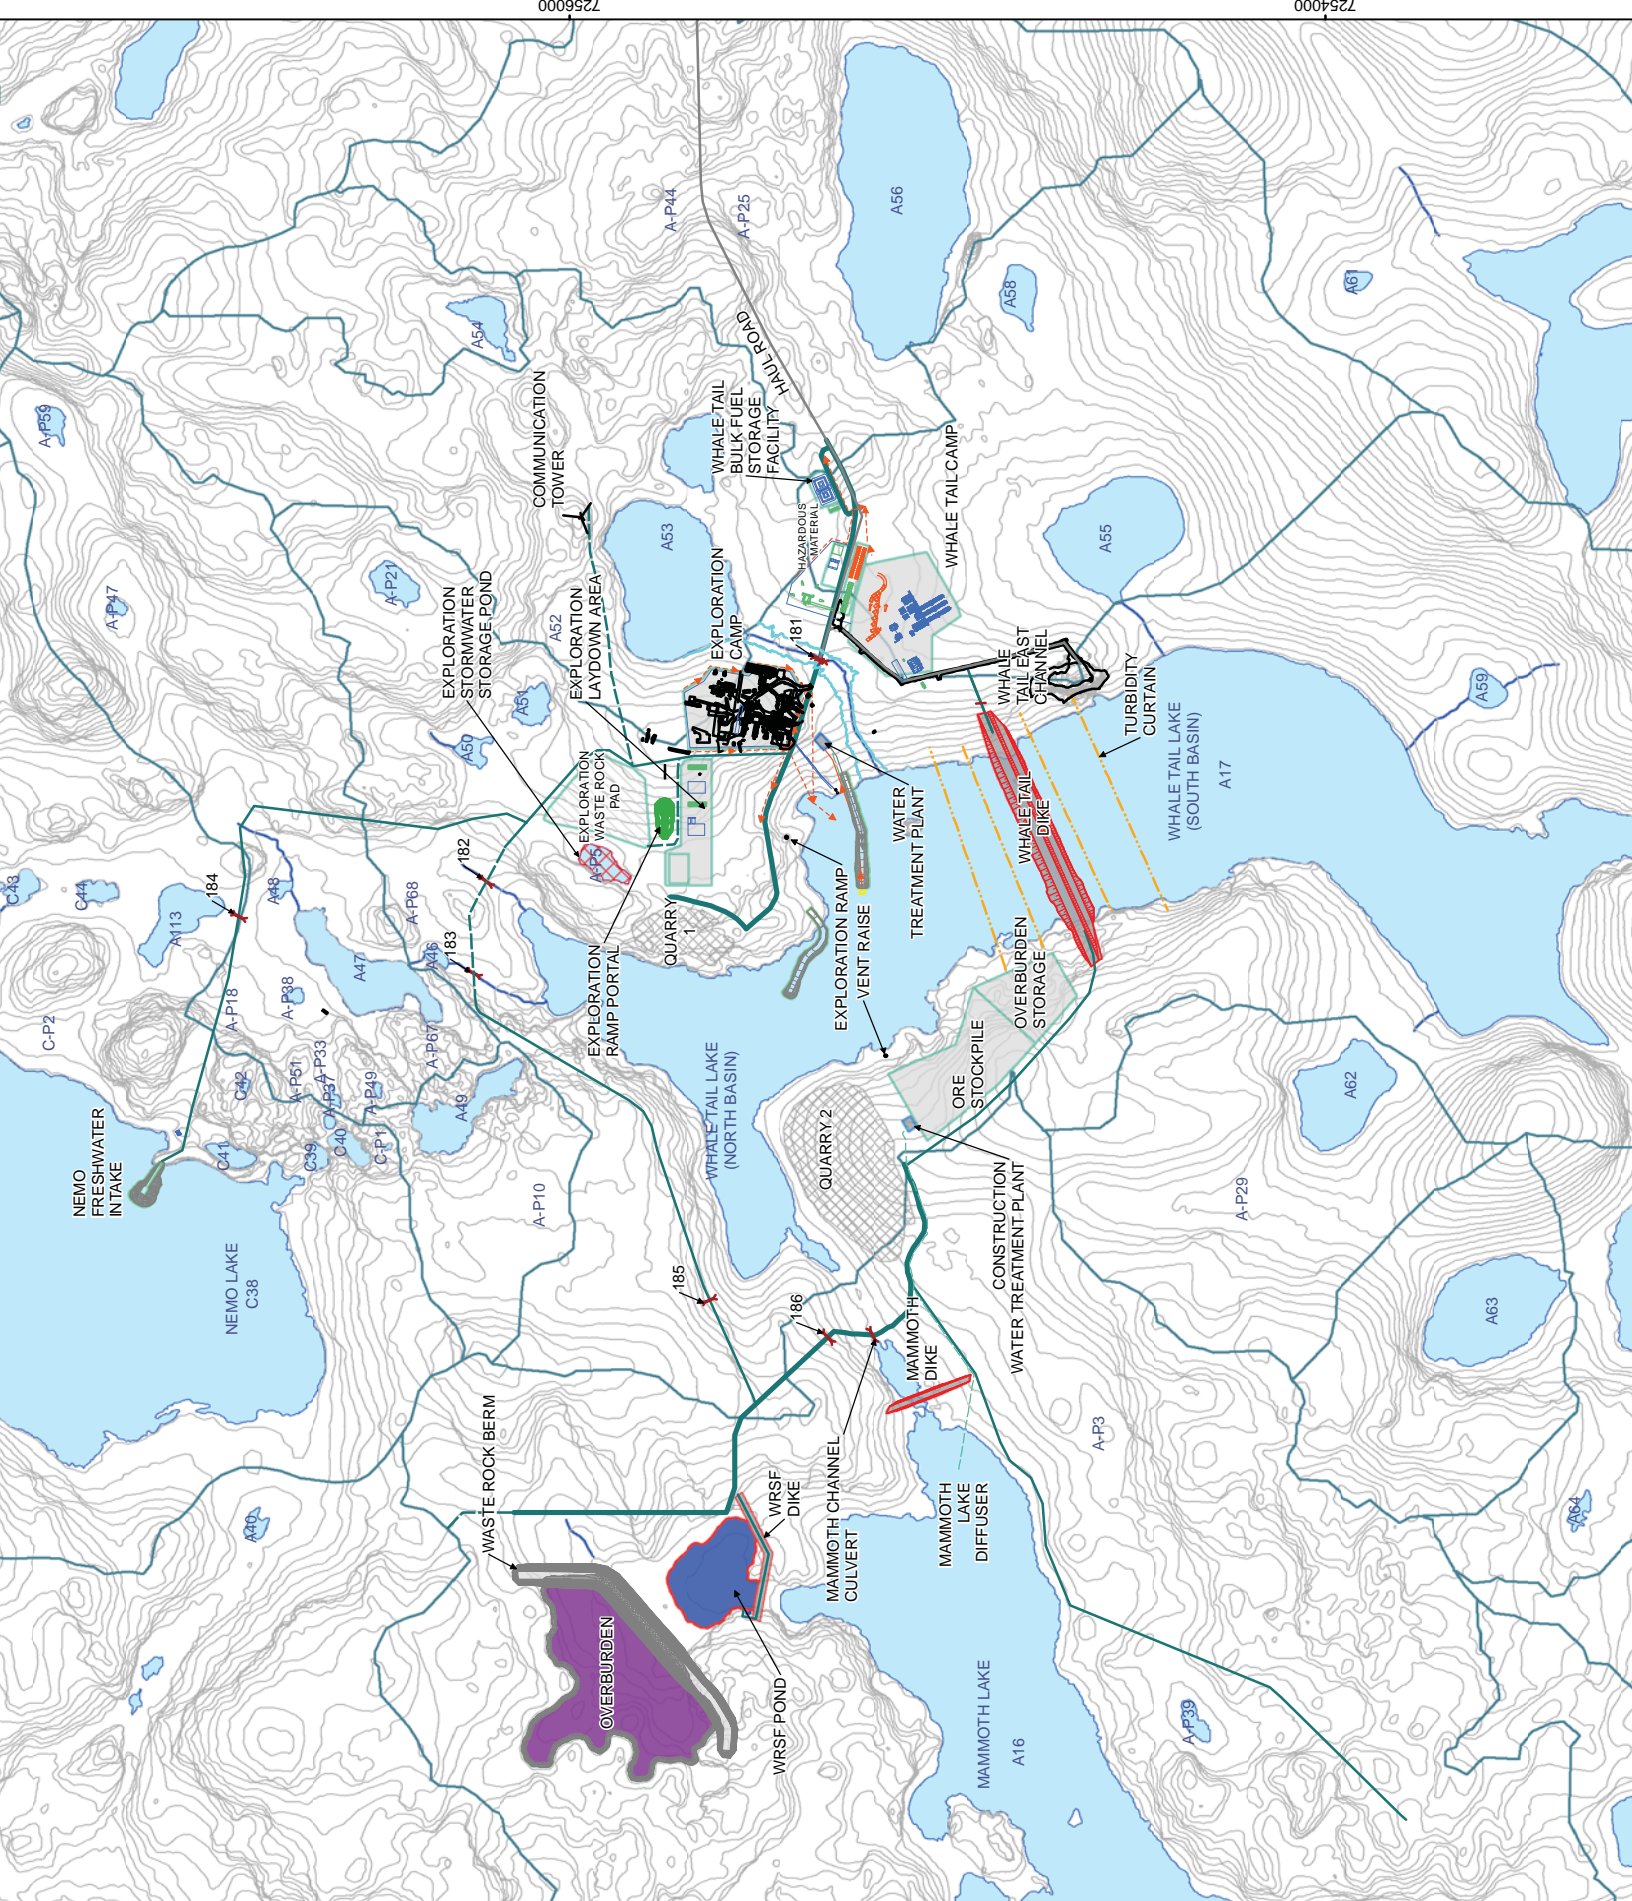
Yearly Site Layout Plan (Year 1: 2019)
